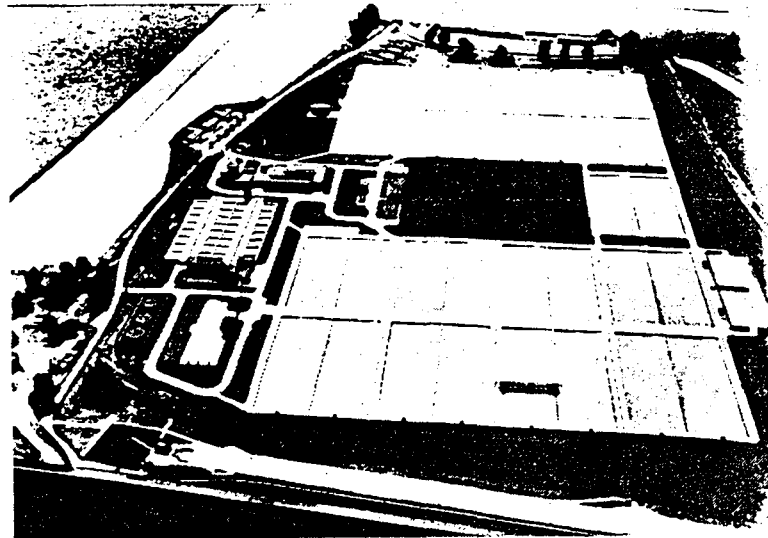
Coppermills plant of the Metropolitan Water Board
